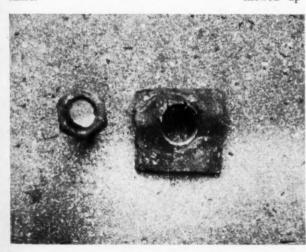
Sheared-Off Bolt-End, with Nut and Bearing Plate.
